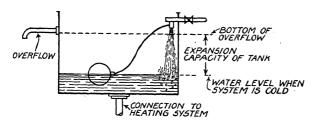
A TYPICAL FEED AND EXPANSION TANK
